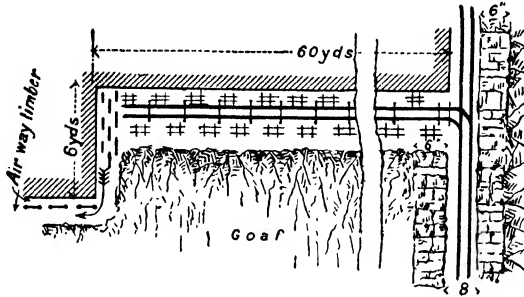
TIMBERING IN MODIFIED LONGWALL WORKING.
